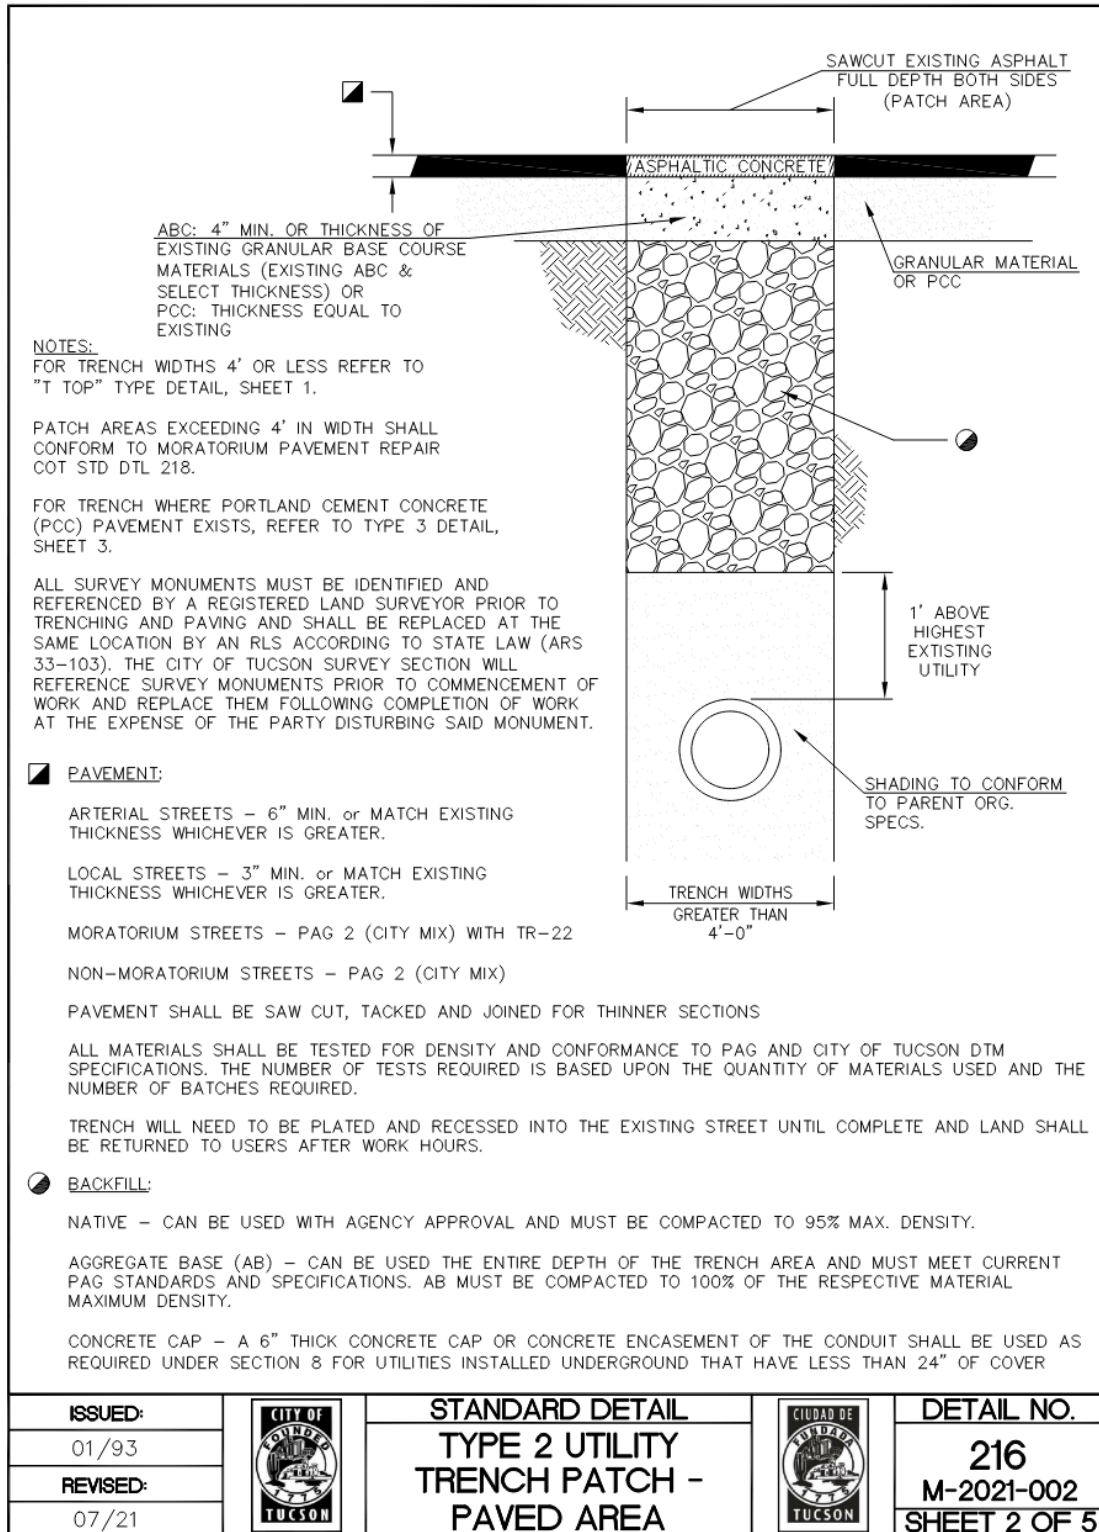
EXHIBIT A: Utility Trench Patch Detail (SD-216)
